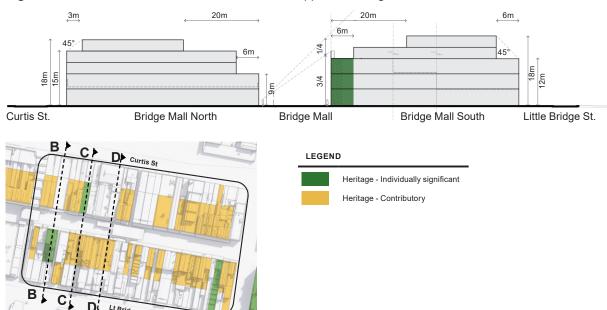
Built form test of street wall, setback and upper level heights- Section B
